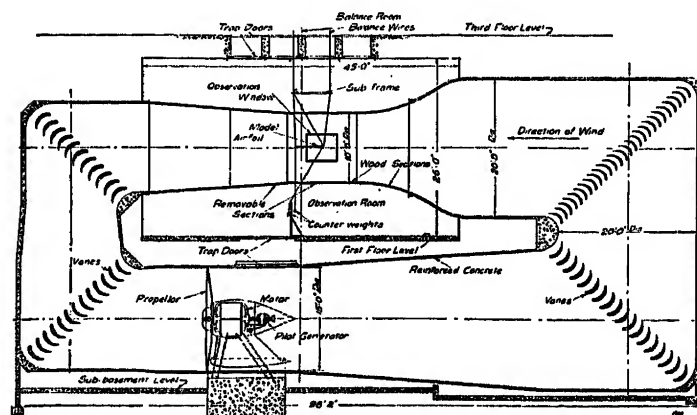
LONGITUDINAL SECTION OF THE WIND TUNNEL (VERTICAL PLANE)
